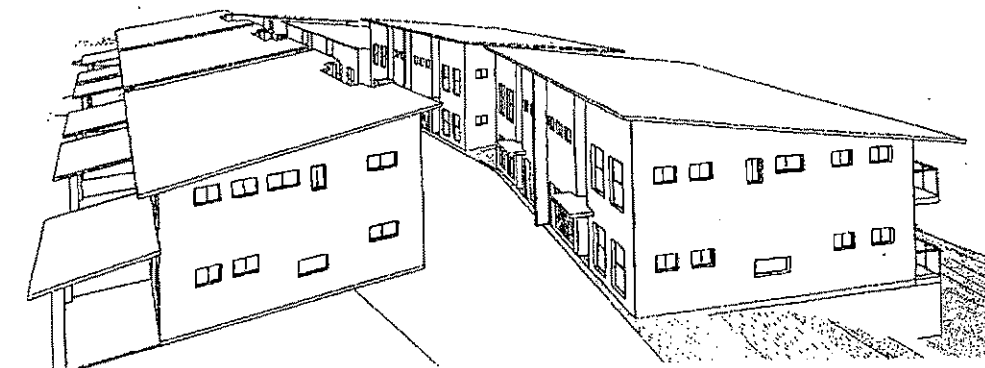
Typical Sections and 3D Views *East Coast Building Design & Drafting
